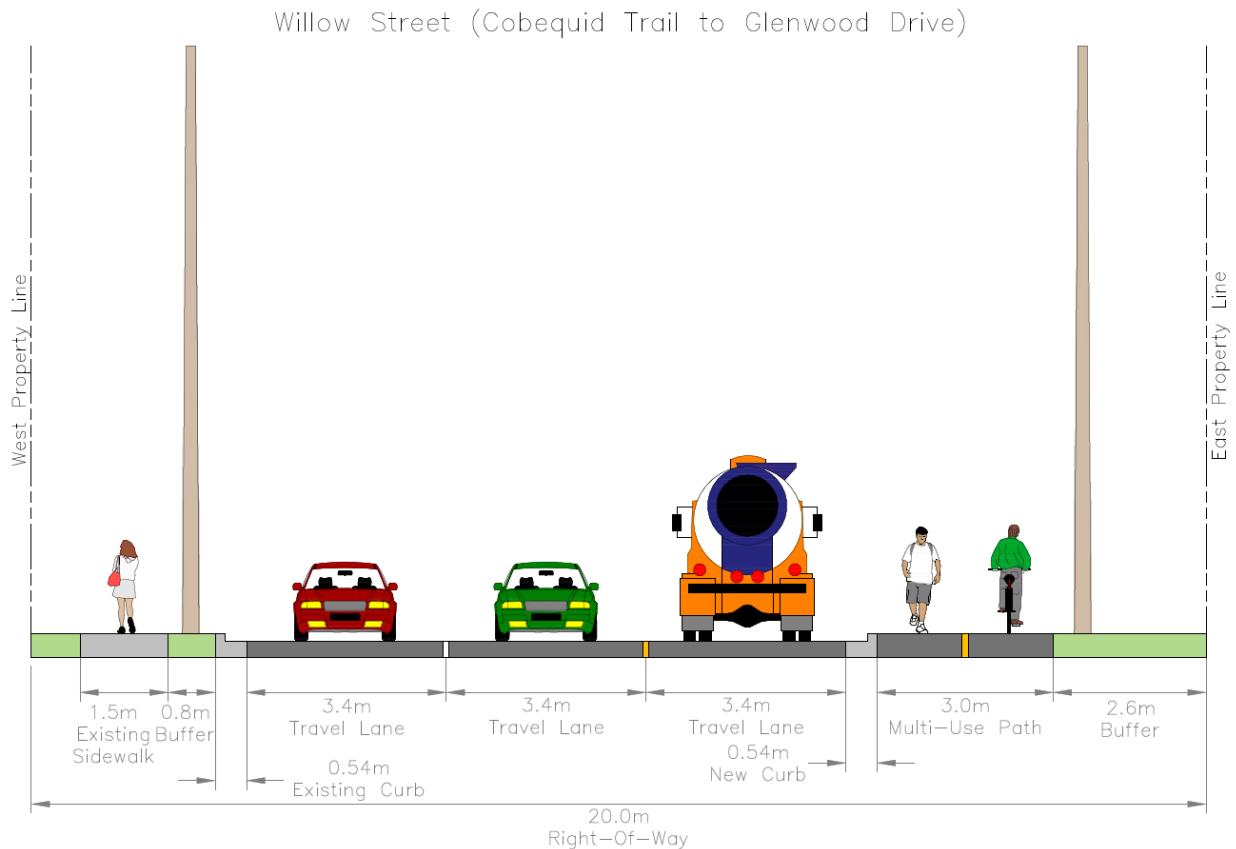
Willow Street between the Cobequid Trail and Glenwood Drive, Revised Cross Section
